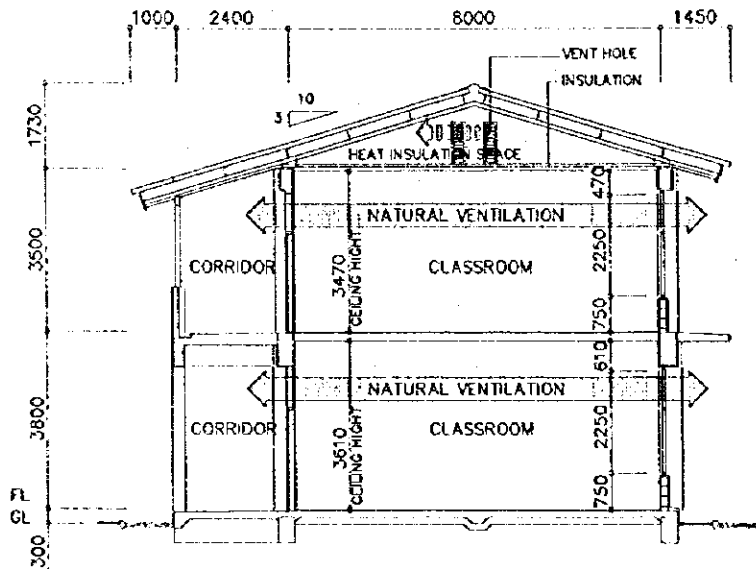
(2) Standard Section of Project Buildings (Two-Storeyed)
